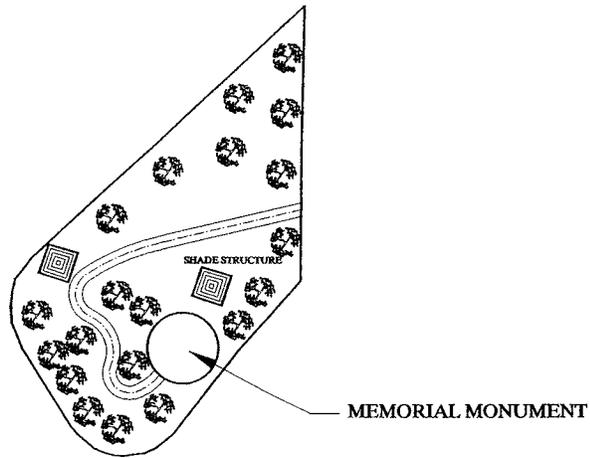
, Conceptual Site Plan for Memorial Park P3
